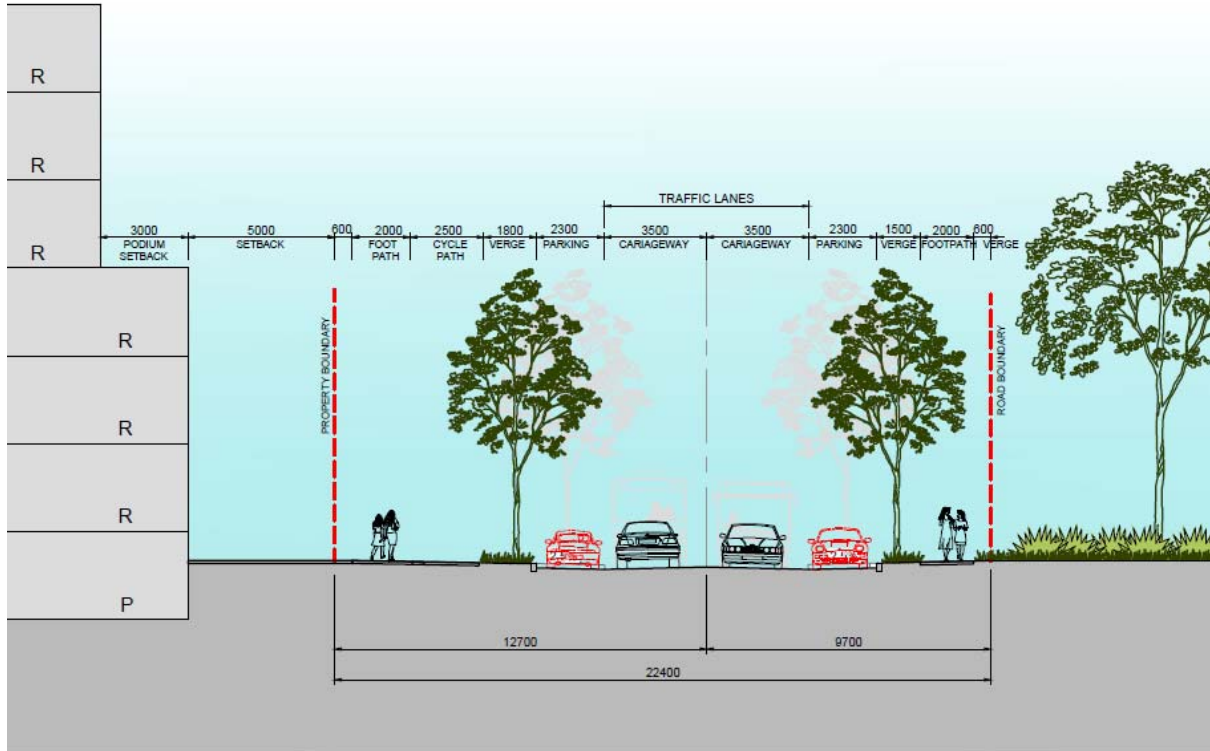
Street section: Collector Road Adjacent to riparian corridor
